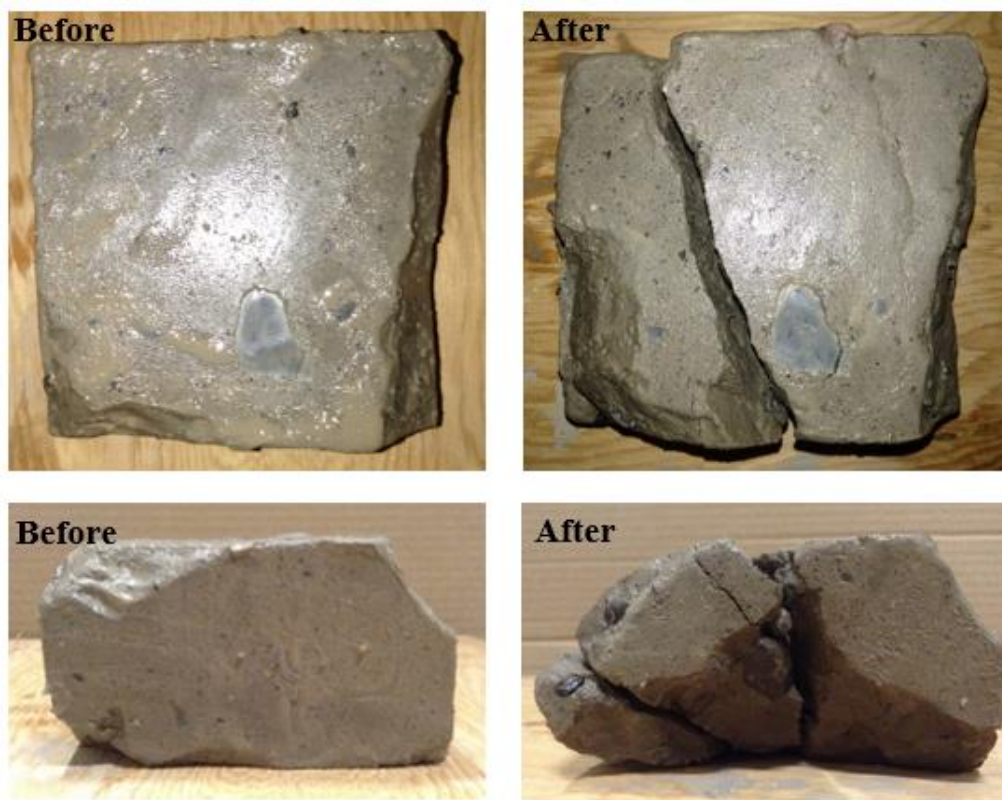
Sample 1 - before and after erosion, top) plan view, bottom) elevation view
